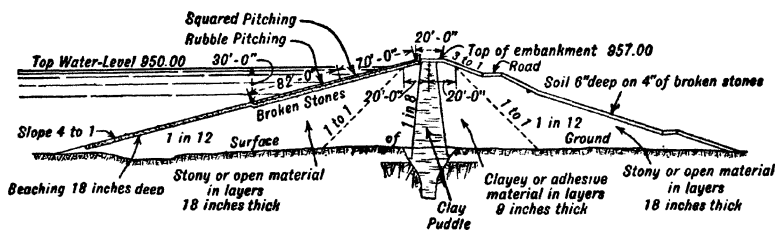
Section of the Talla Dam of Edinburgh, Scotland, Waterworks. Built in Rolled Layers.\
